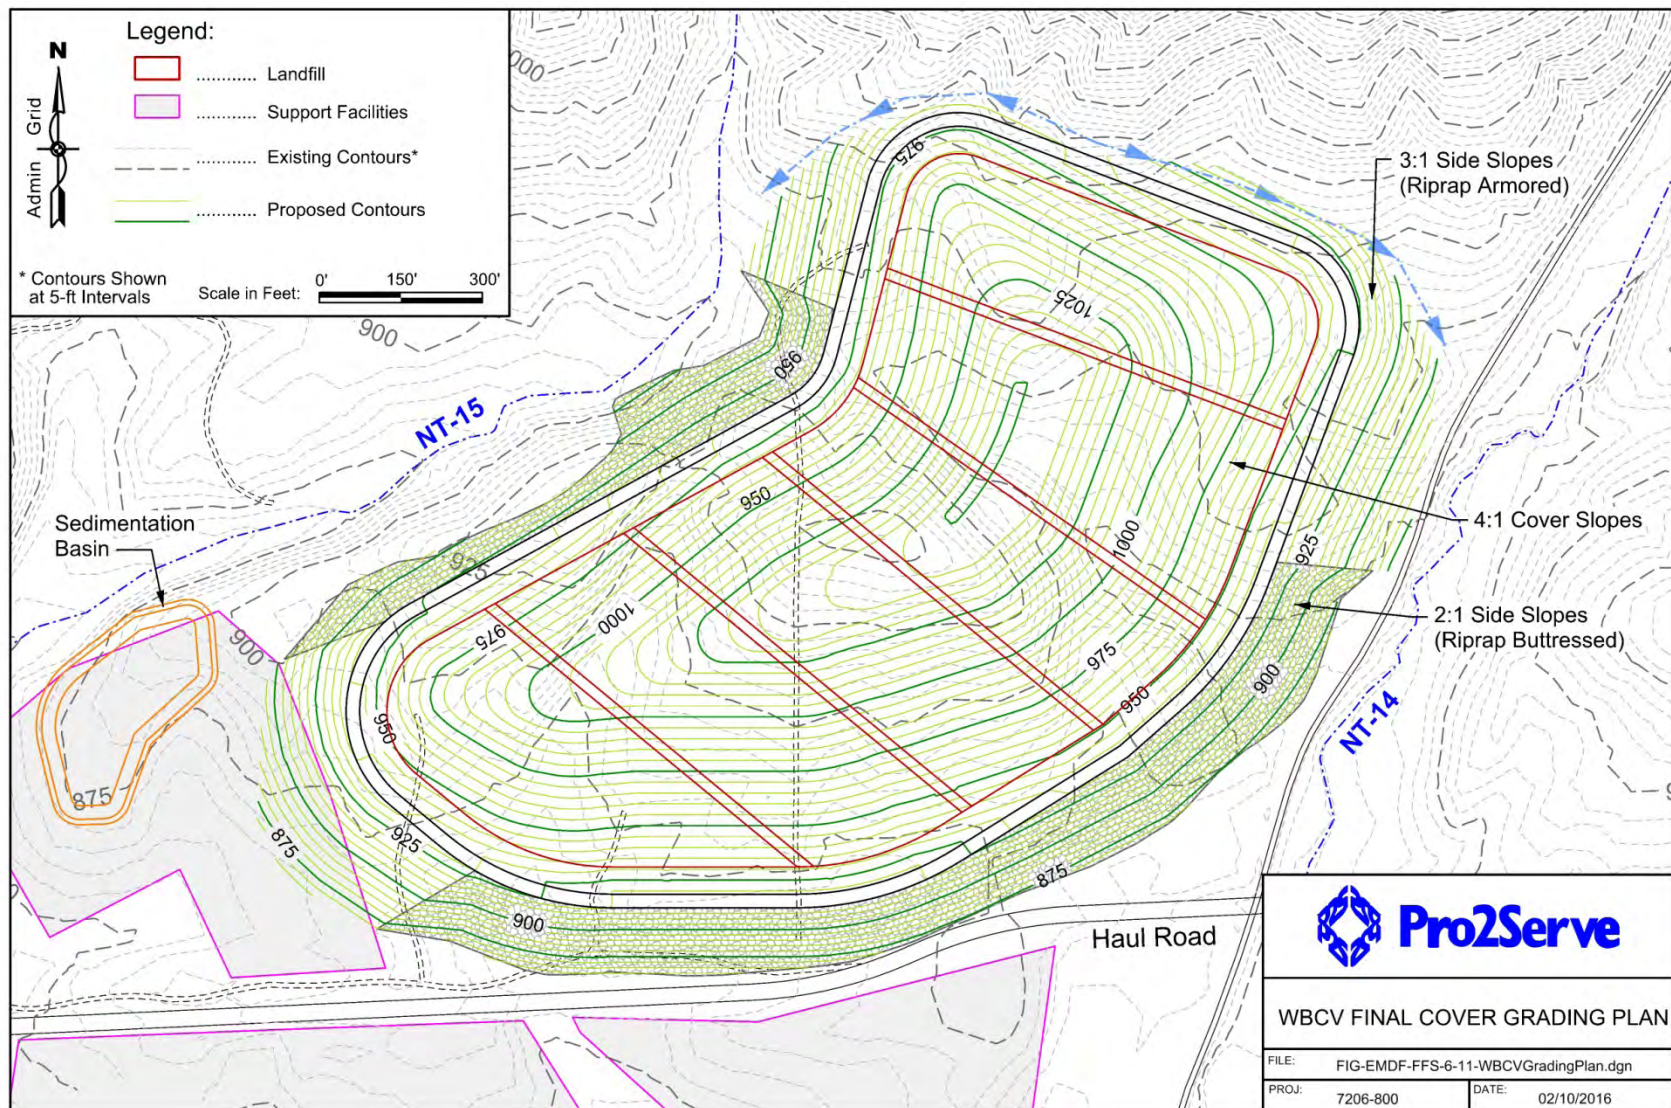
EMDF Final Cover Grading Plan for WBCV Site
